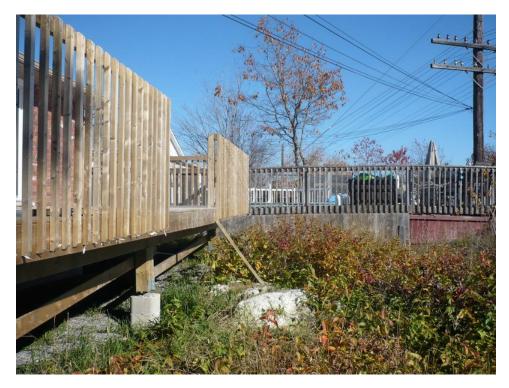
953 HOWEY DRIVE, SUDBURY – VIEW OF REAR DECK FACING SWIMMING POOL ON PROPERTY ABUTTING EAST
